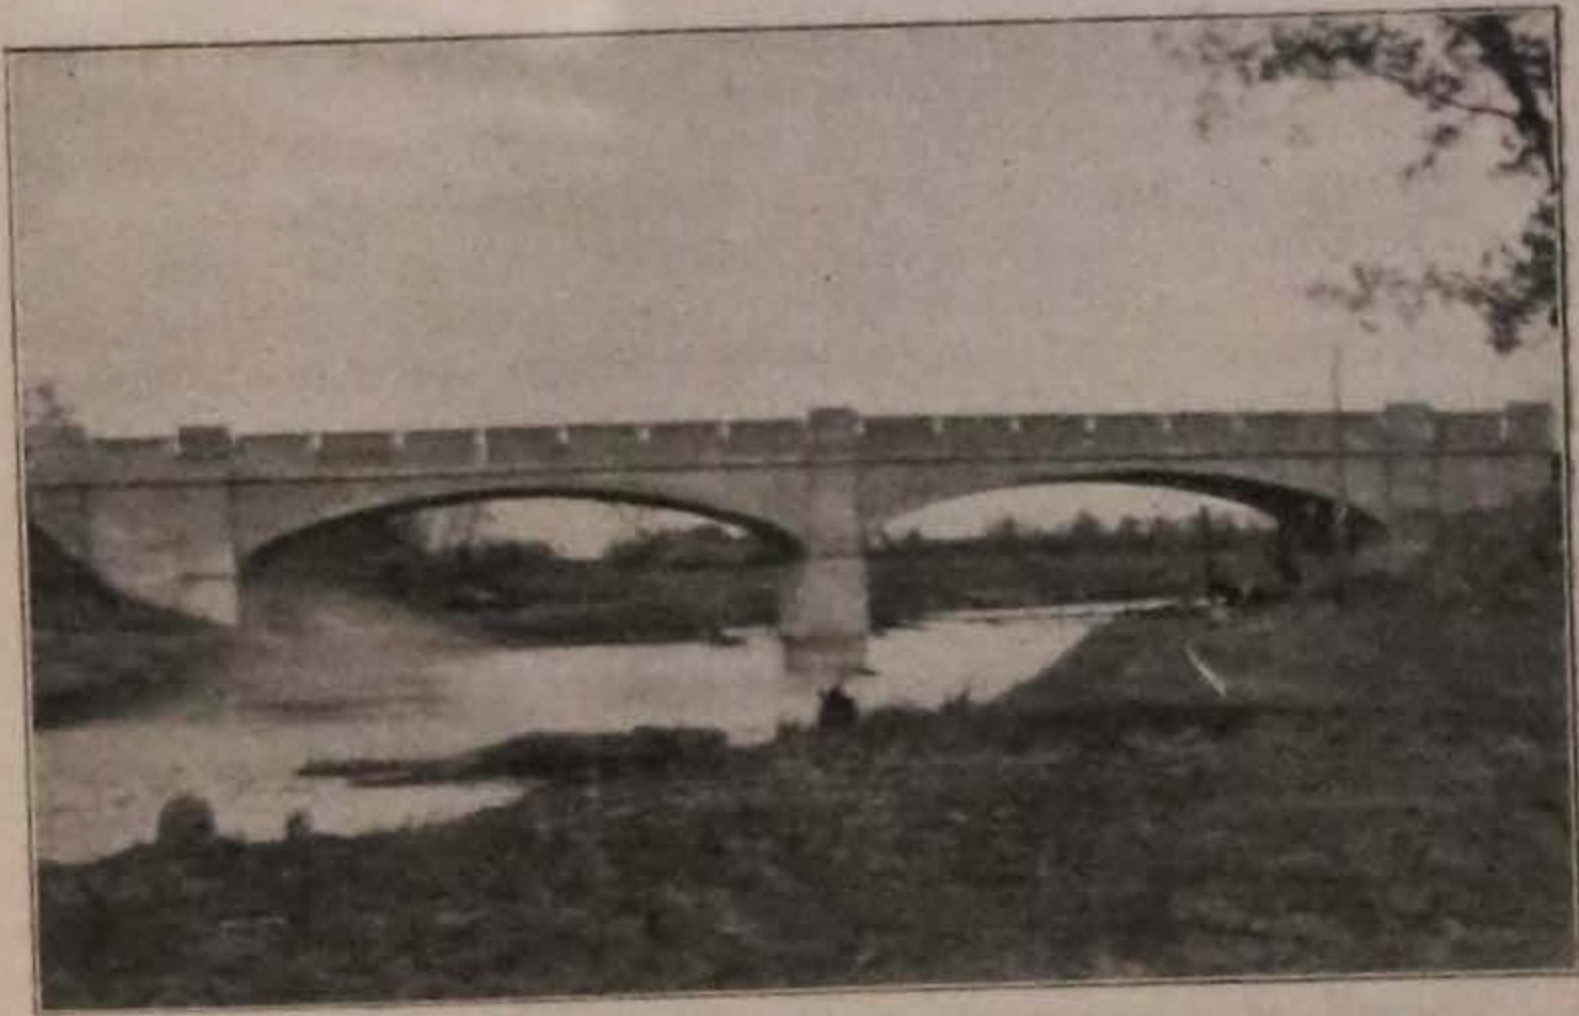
Reinforced Concrete Arch near Jefferson, Iowa
